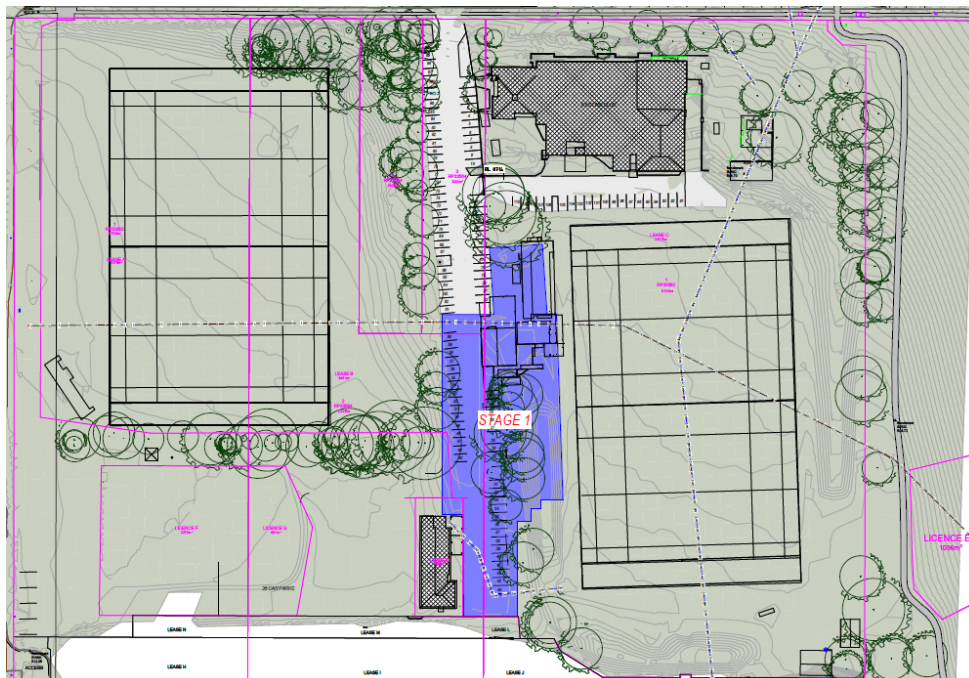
Indicative Extent of Revised Stage 1 Works (Source: Rohrig Constructions 2026)
